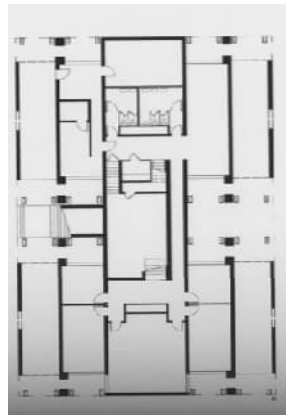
First floor plan of the chancellery with the plan rotated 90 degrees so that Kahn’s intended north elevation is now oriented to the left and, by convention, facing west. (Drawing by Robert McCarter)
